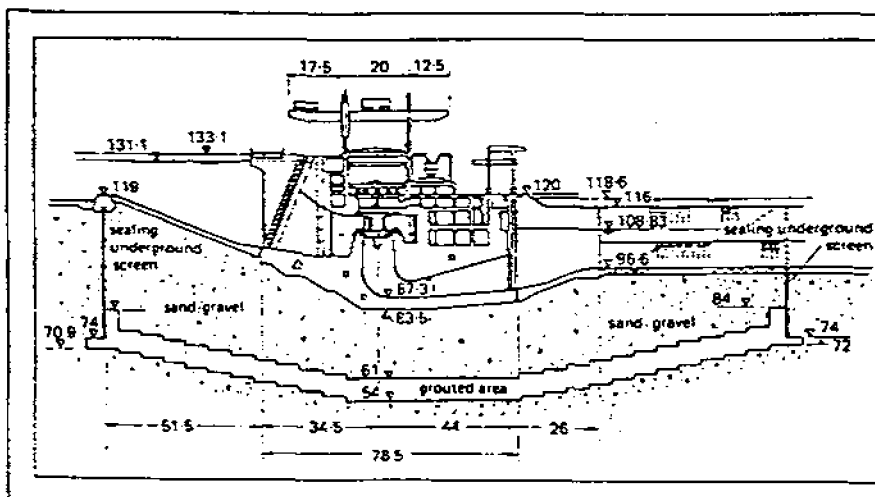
Cross section of the foundation of the Gabčíkovo plant.
